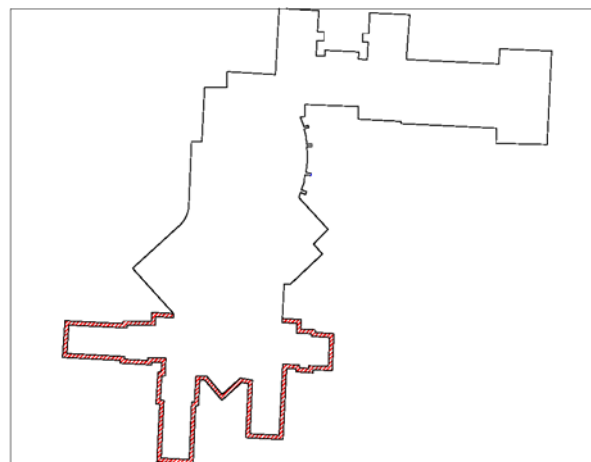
Cast-in-place concrete foundation wall location. Red indicates location of wall.
